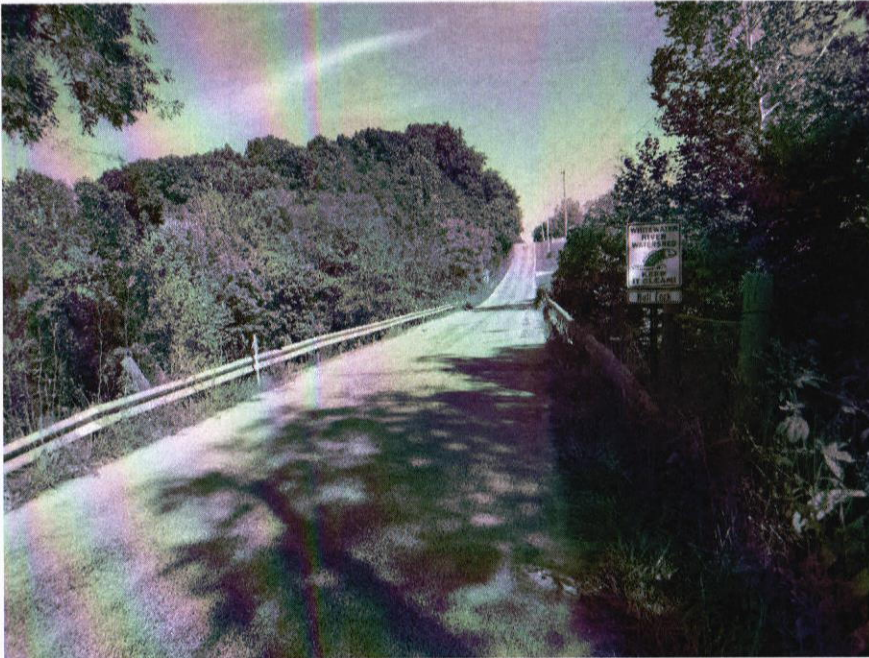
Facing north along N Hamburg Rd, toward the bridge over Bull Fork Salt Creek.
